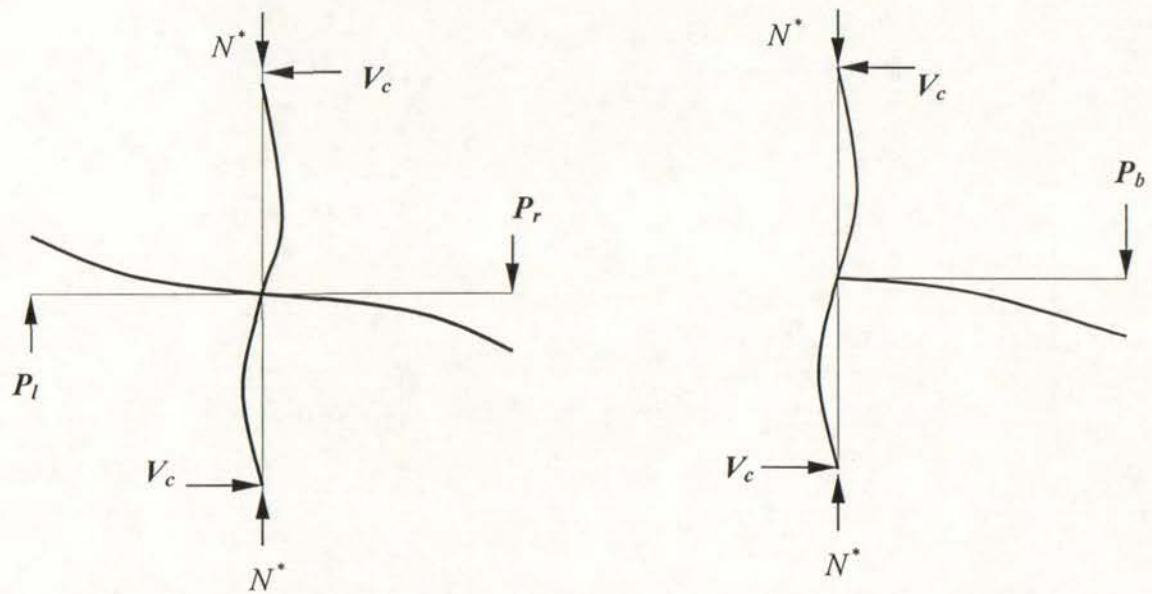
Method of Loading Exterior Beam-Column Joints
